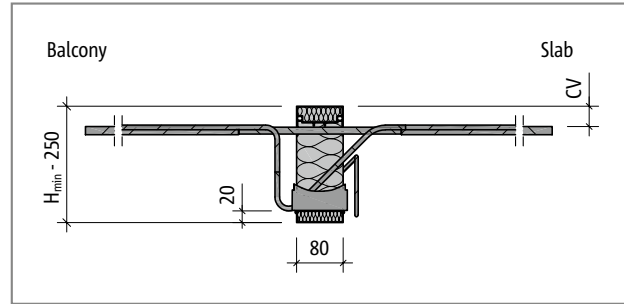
Schöck Isokorb® T type K-E-M8: Product section
